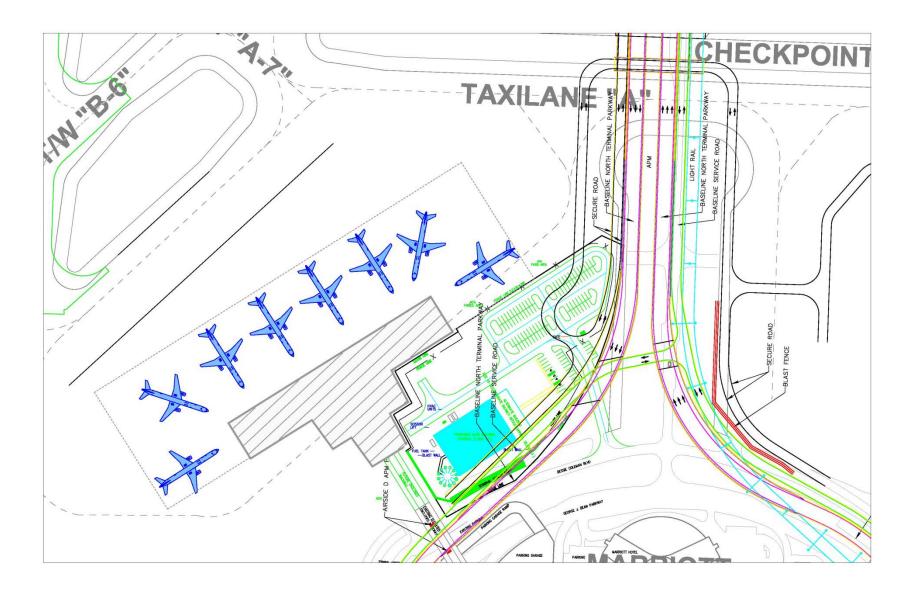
HNTB PROPOSED FAA ATCT AND TRACON W/ FUTURE ROADWAY SYSTEM TO NORTH TERMINAL COMPLEX
